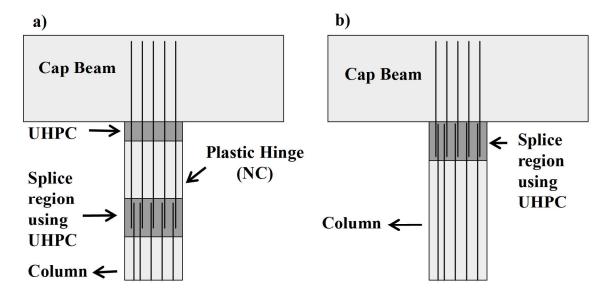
Details of the concept of the proposed connection a) Seismic detail b) Non-Seismic detail.
